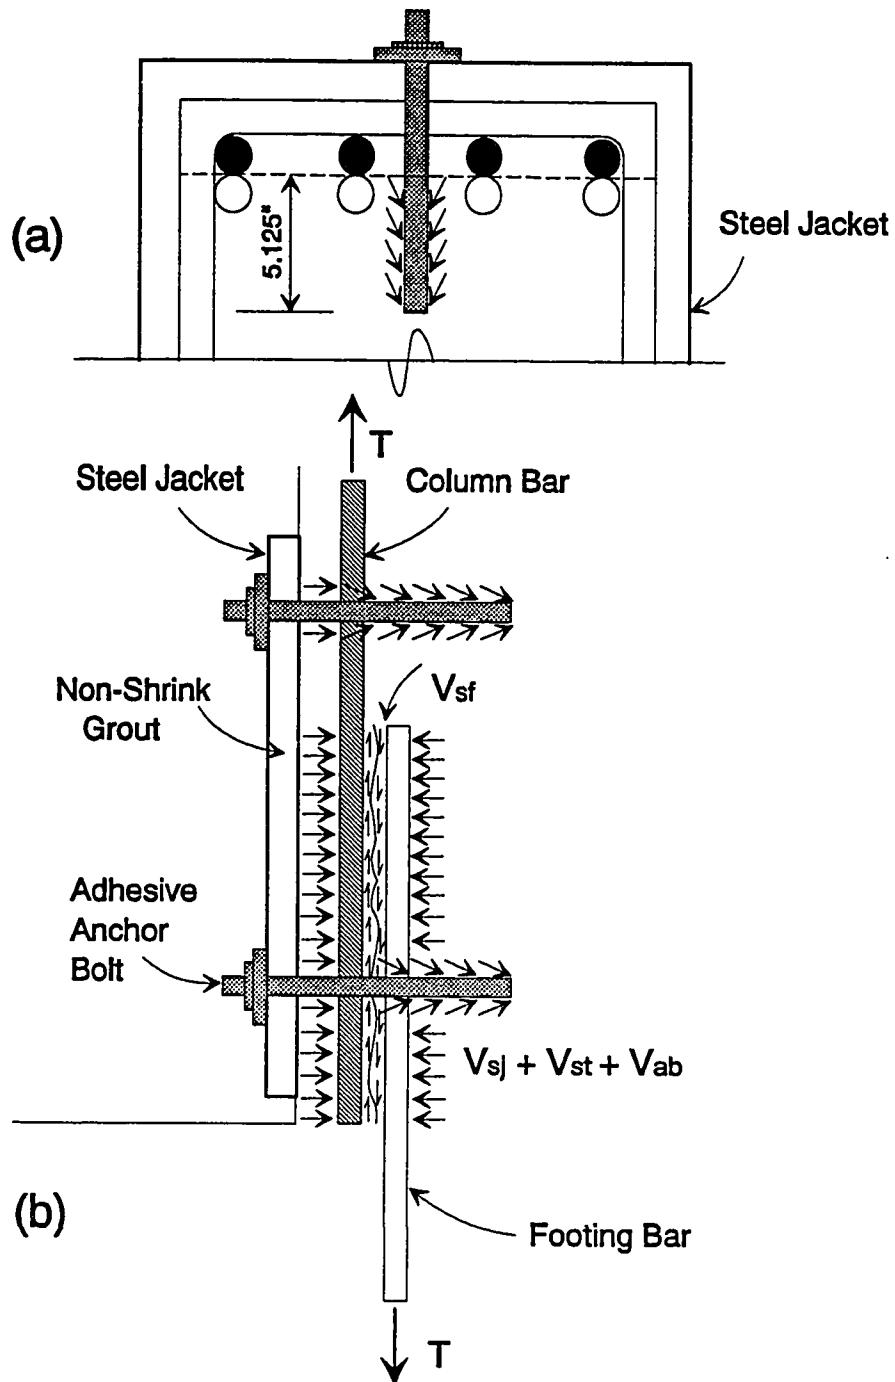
Detail of Adhesive Anchor Bolt in the Splice Region : (a) Plan (b) Side View
